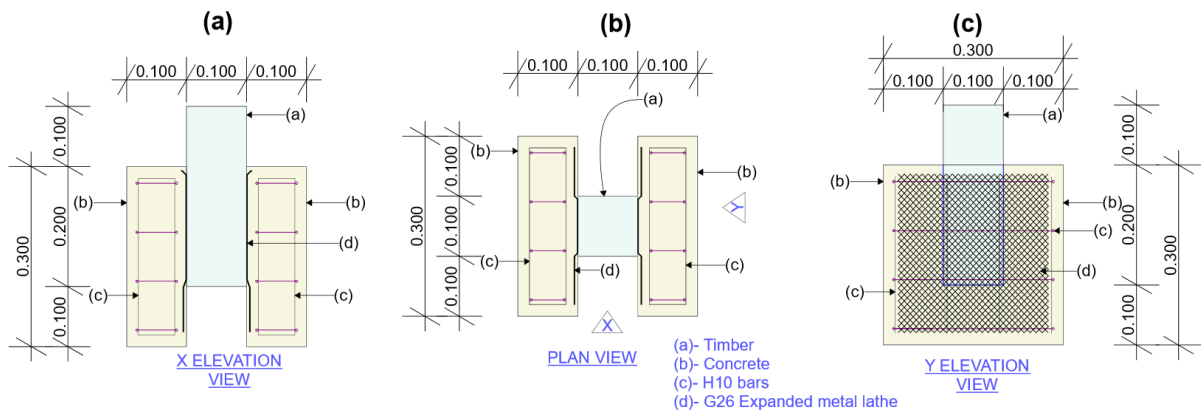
Shear connector experiment set up for the expanded metal lathe (a) Elevation X, (b) Plan view and (c) Elevation Y
